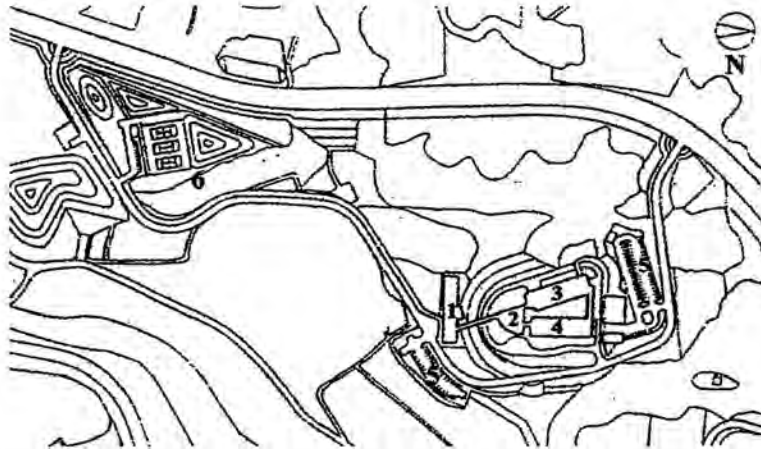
Site plan of Kazusa DNA Research Institute
